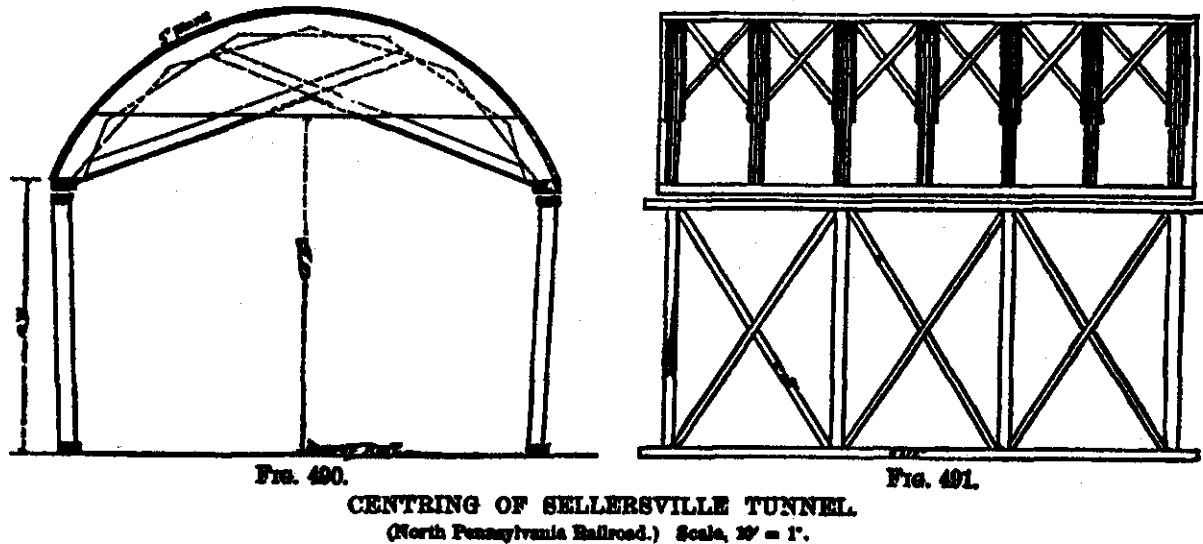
Arch centering used in construction of Landis Ridge (Sellersville) Tunnel. Source: Henry S. Drinker, *Tunneling, Explosive Compounds and Rock Drills* (New York: John Wiley & Sons, 1878), 549.
